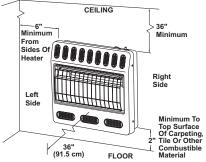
Mounting Clearances As Viewed From Front of Heater
